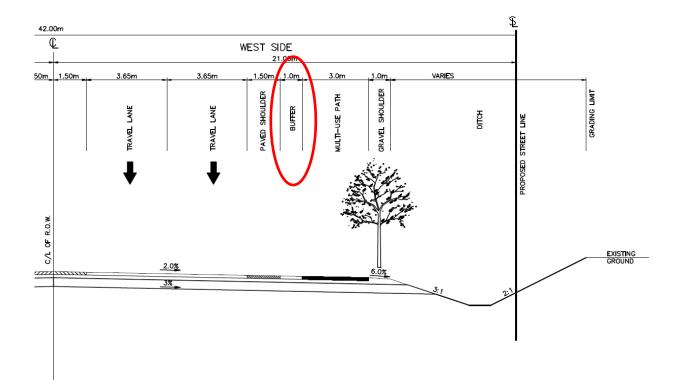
Porous Buffer between Paved Shoulder and Multi-use Path in "Rural" Cross Section
